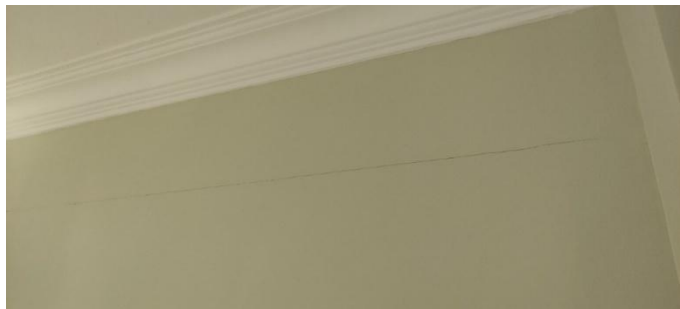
Cracks that form along the joint line in walls constructed without mesh application.
